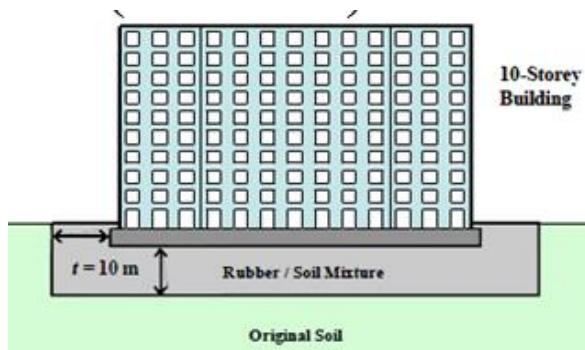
RSM system around the foundation of a building (Tsang et al., 2007,2011)
